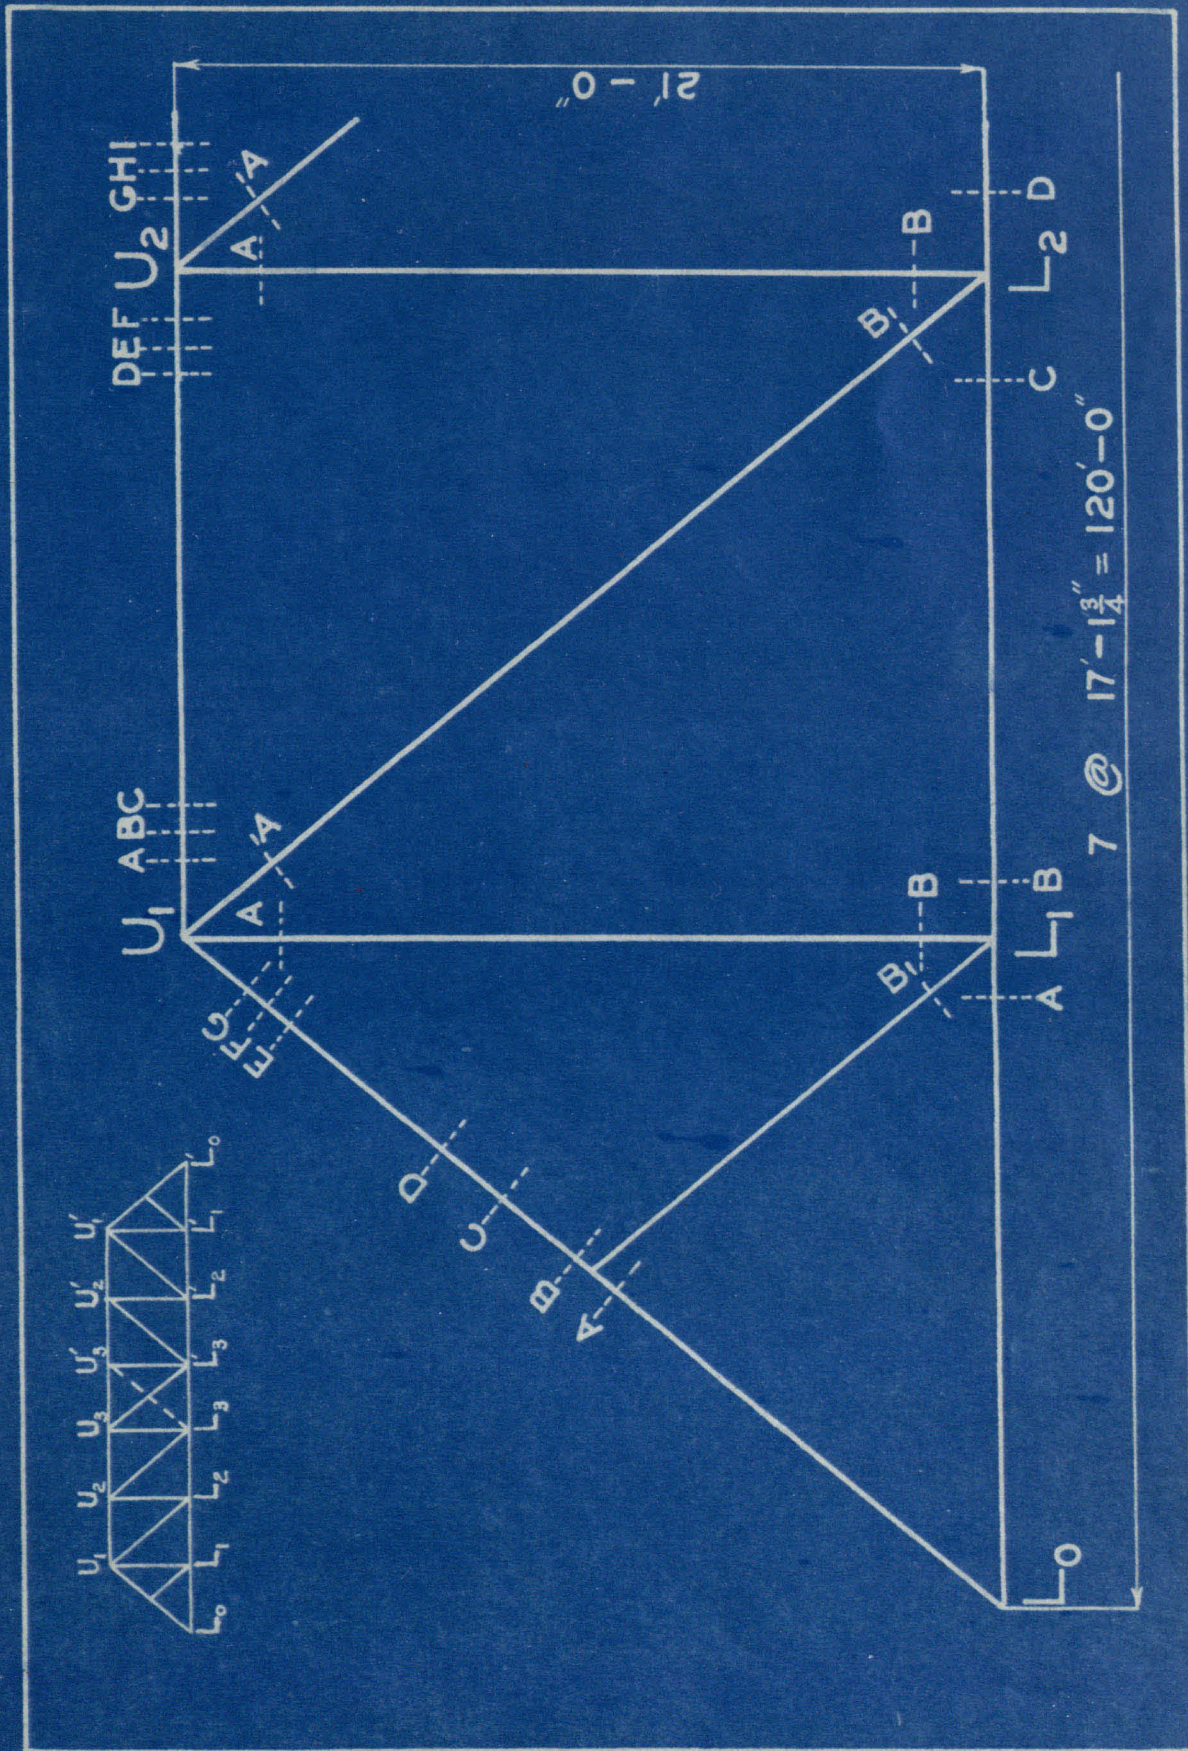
ELEVATION OF TRUSS SHOWING LOCATION OF GAGE LINES
